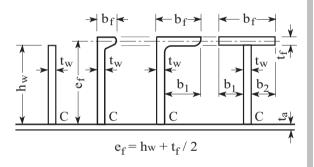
Main dimensions of typical longitudinal stiffeners
